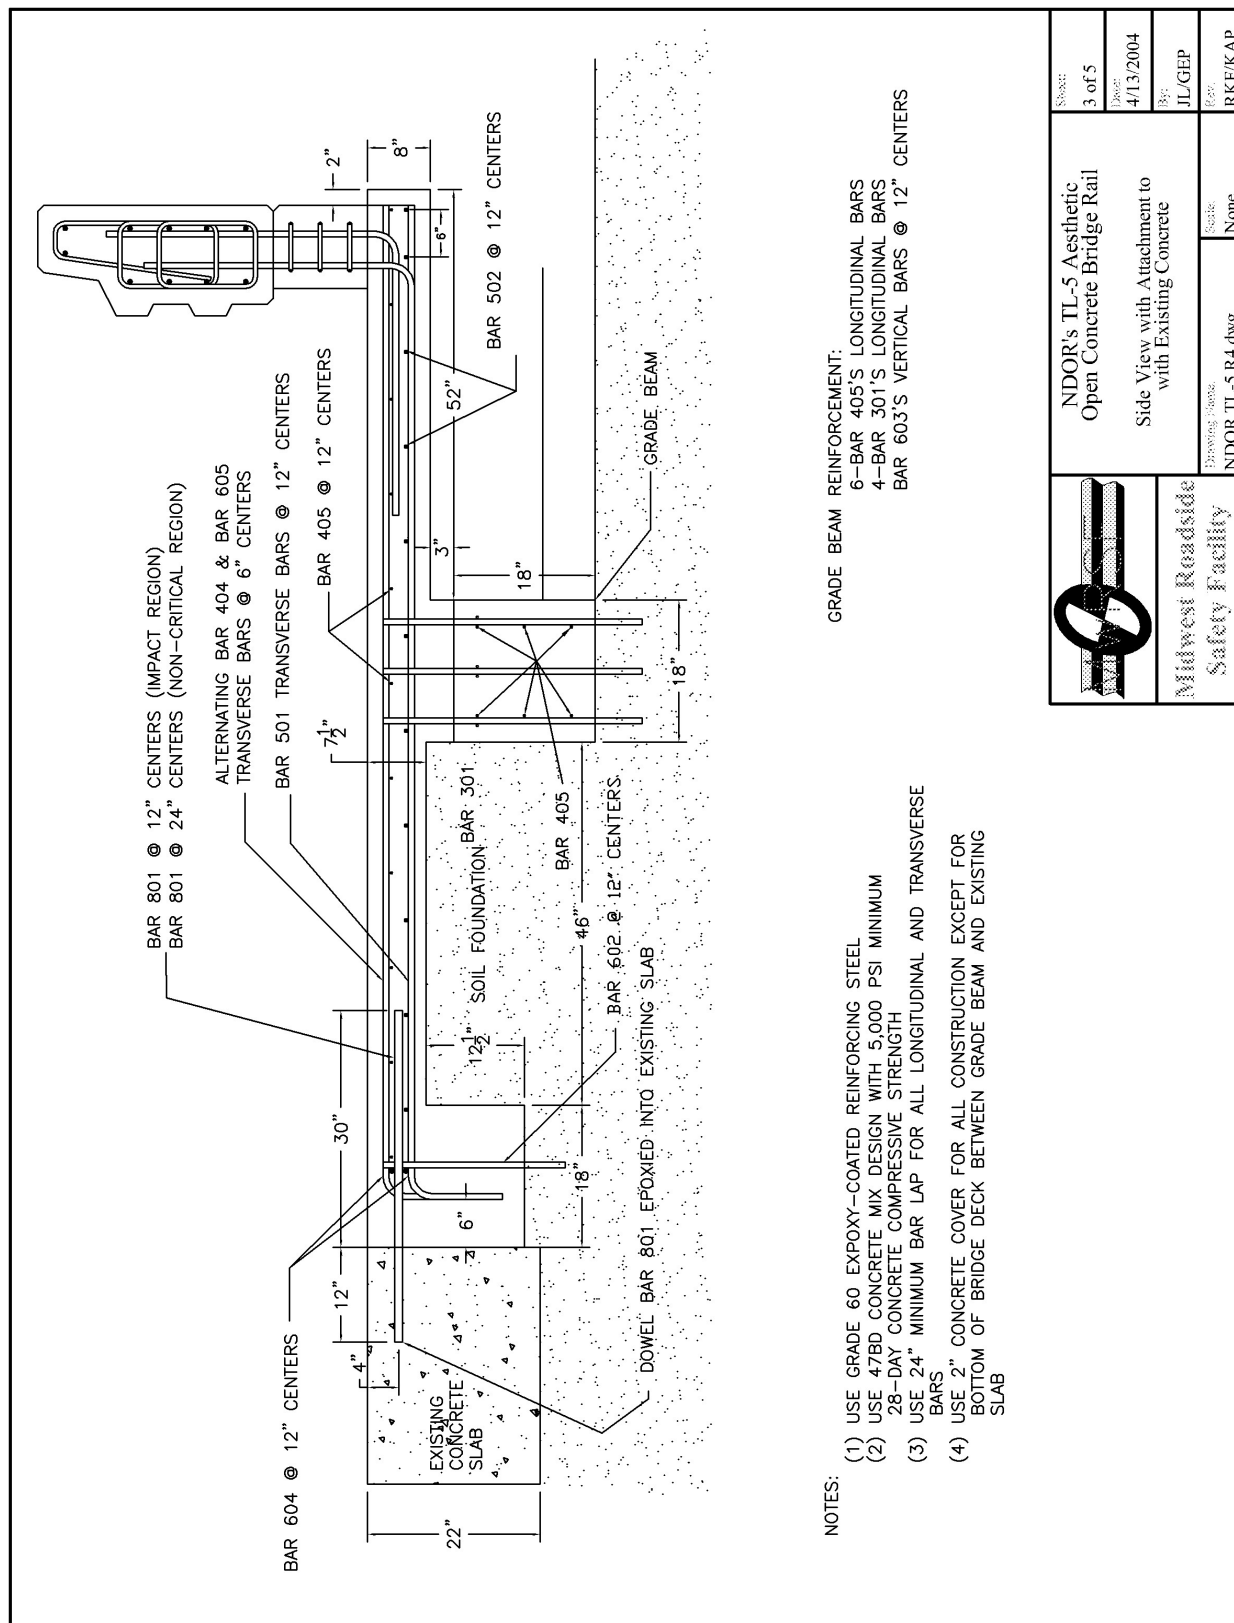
NDOR's TL-5 Aesthetic Open Concrete Bridge Rail Attachment to Existing Concrete Design Details (English)
